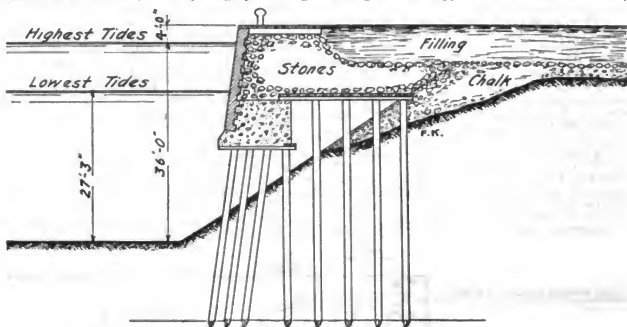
Shows a cross section of a typical quay wall, that of Rouen, France. The lower section of the quay wall was built inside watertight caissons with removable sides. It was sunk on top of wooden foundation piles which were cut off 25 feet below coping. The wall is designed to support a load of five tons per square foot. The lower section of the wall is of concrete, the upper of rubble masonry faced with brick. The teds connect the quay wall with anchor blocks a short distance away. For a distance of 200 feet the back of the wall is filled in. The cost of this construction per lineal foot was \$180.
